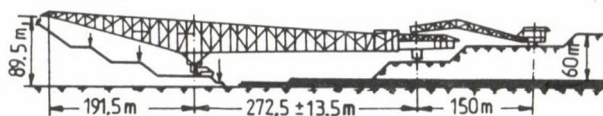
Overburden conveyor bridge for 60 m thickness to be excavated
